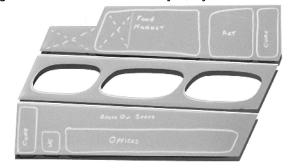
First Floor Plate - White Pencil on Frosted Acrylic
